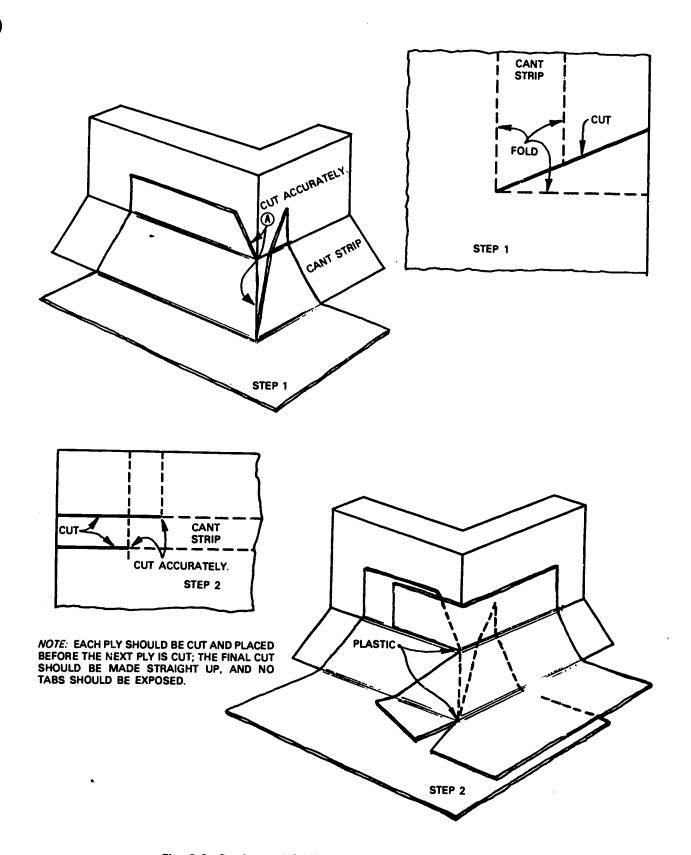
Cutting and folding an outside corner with a cant strip
